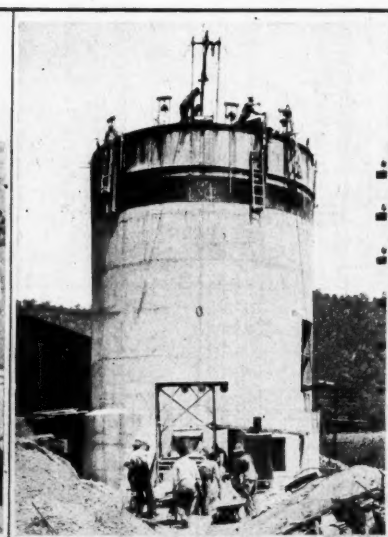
Concreting Actual Tank Bottom and Section Above Tank Bottom.
